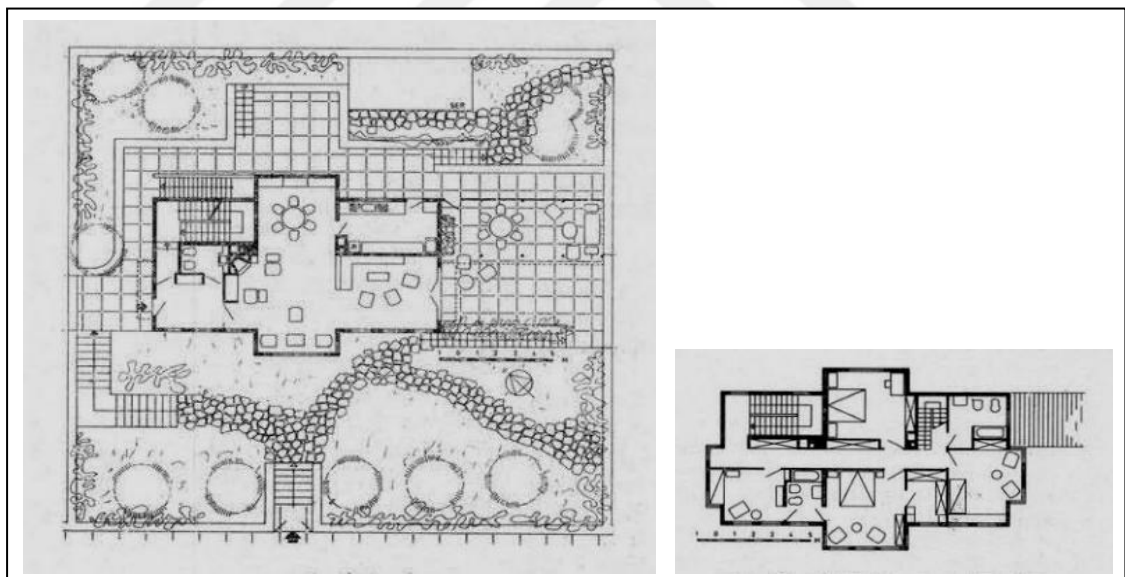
Floor plans of a summer resort in Orhantepe, 1970s [152]
